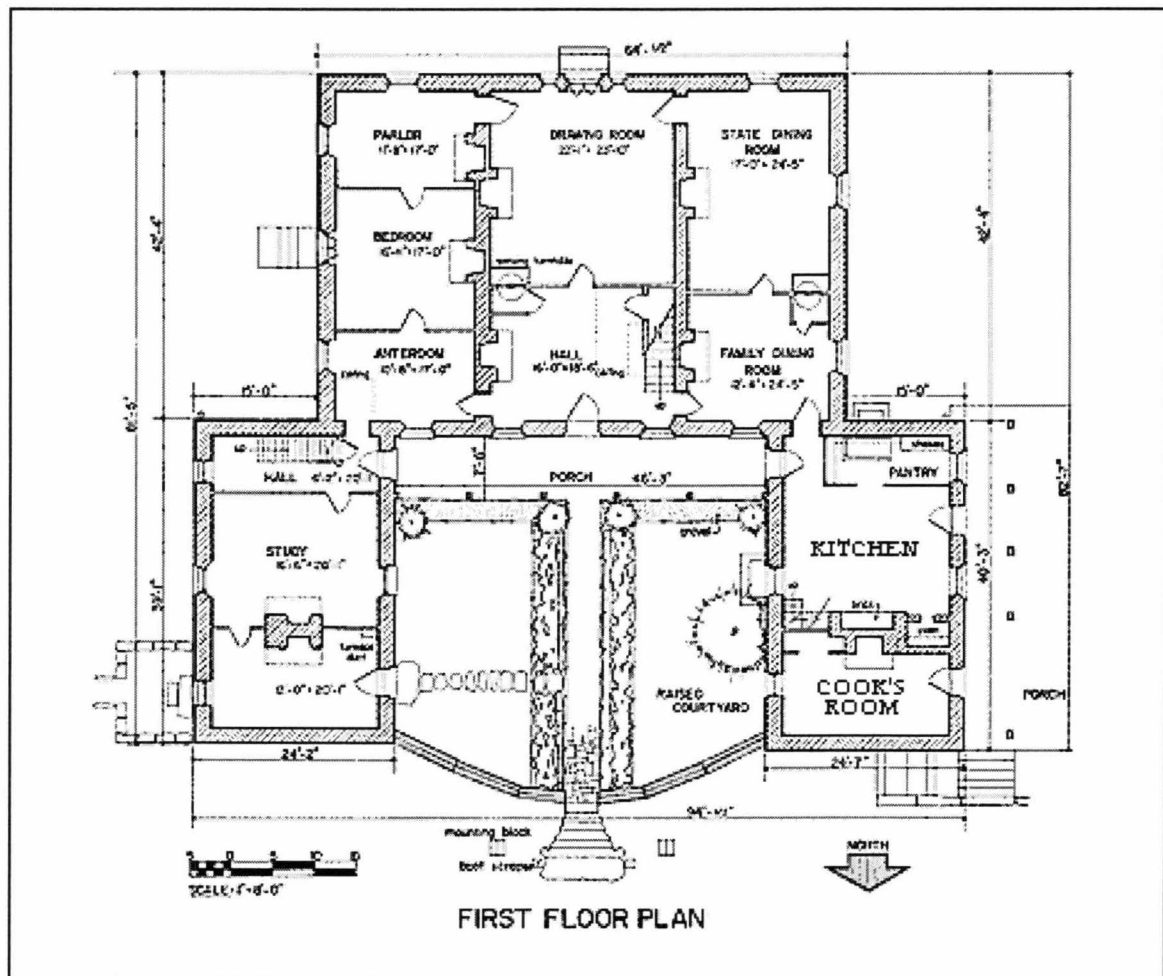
First floor plan of Adena (Historic American Buildings Survey).
